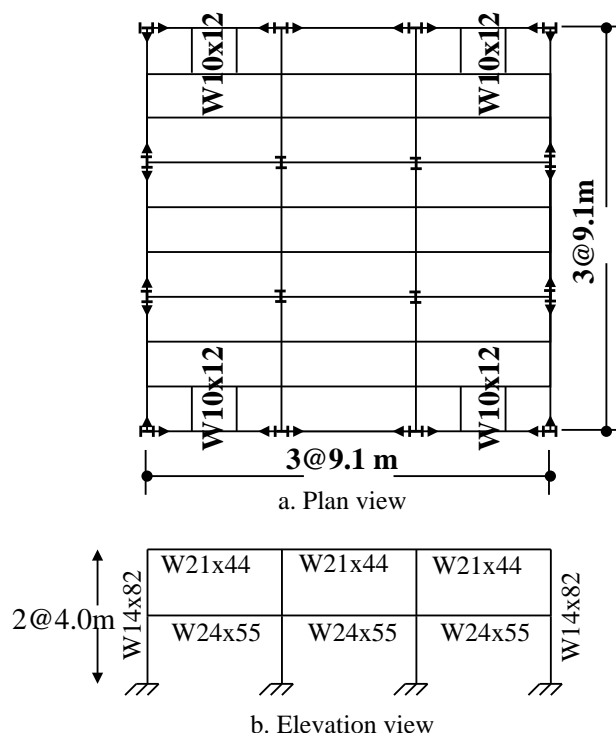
Plan view and elevation of the prototype steel office building designed in 1980s in California.
